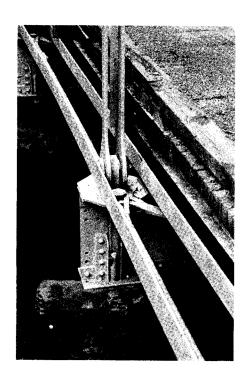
Lower joint connection detail of metal truss in Figure 14.
